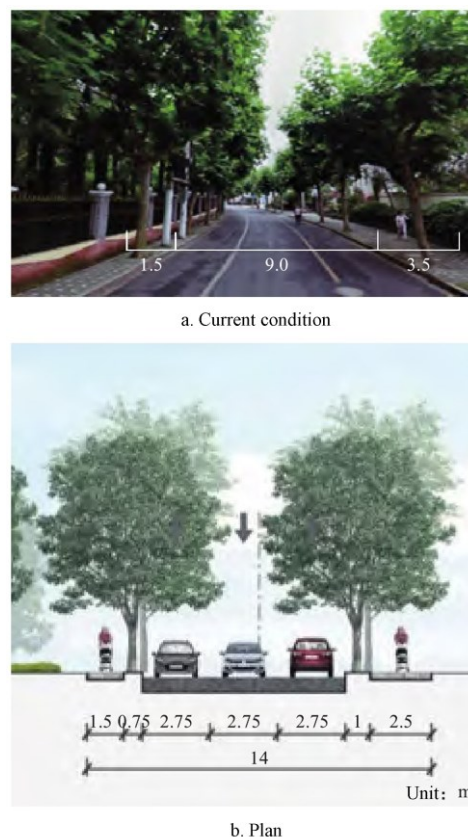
Comparison of cross section reconstruction of Meiling South Road
